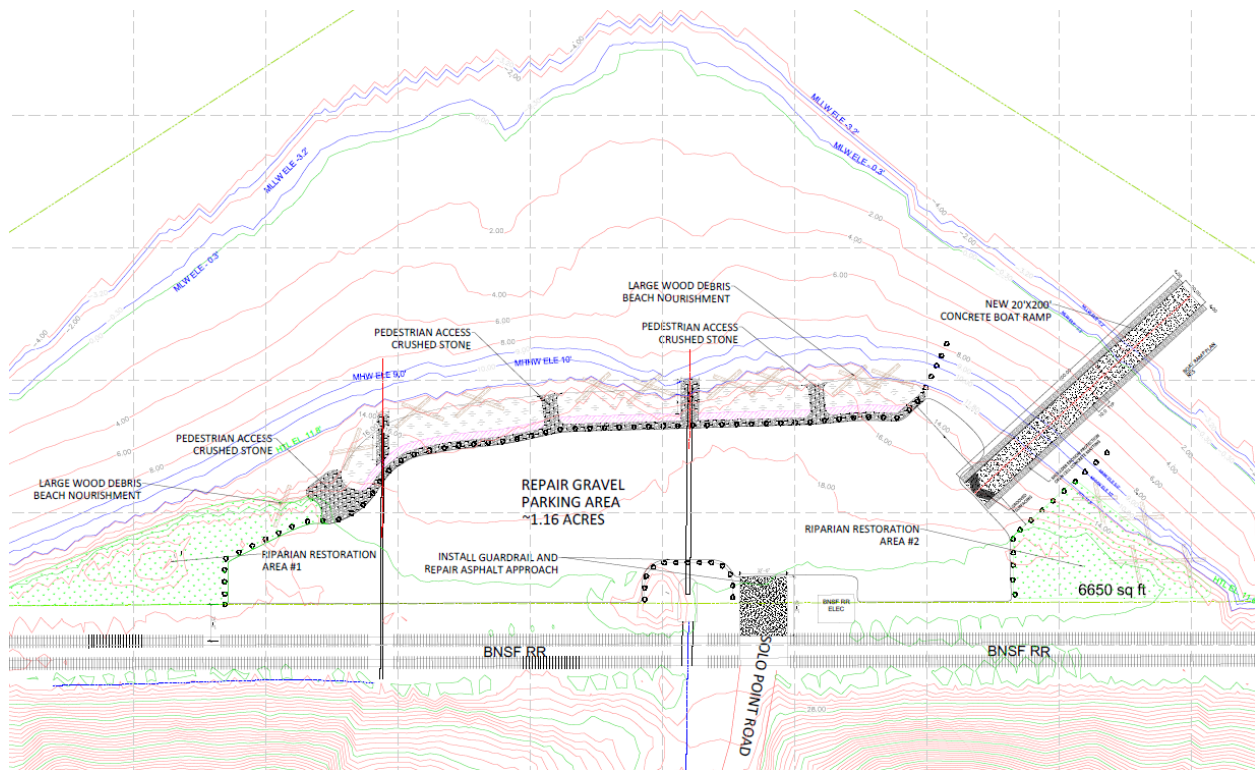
Proposed site plan with replacement boat ramp, hybrid shoreline armoring, plantings, pedestrian access locations, and boulder placement.
